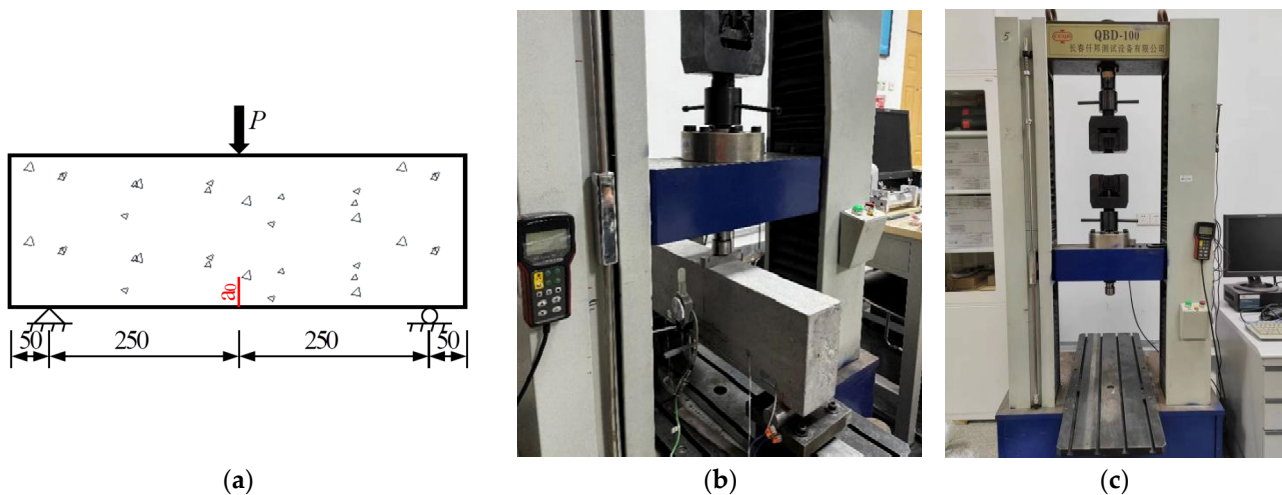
Three-point bending fracture toughness test: (a) Schematic drawing of test setups (dimensions in mm); (b) Photo of test setups; (c) Photo of testing machine.
